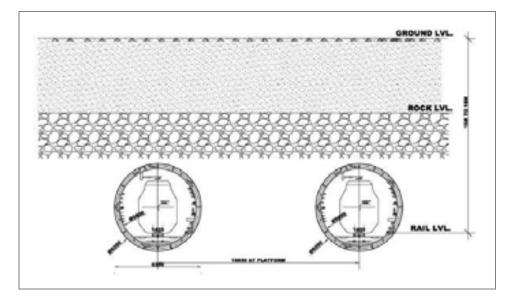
Two twin tunnels arrangement considered for underground section.
